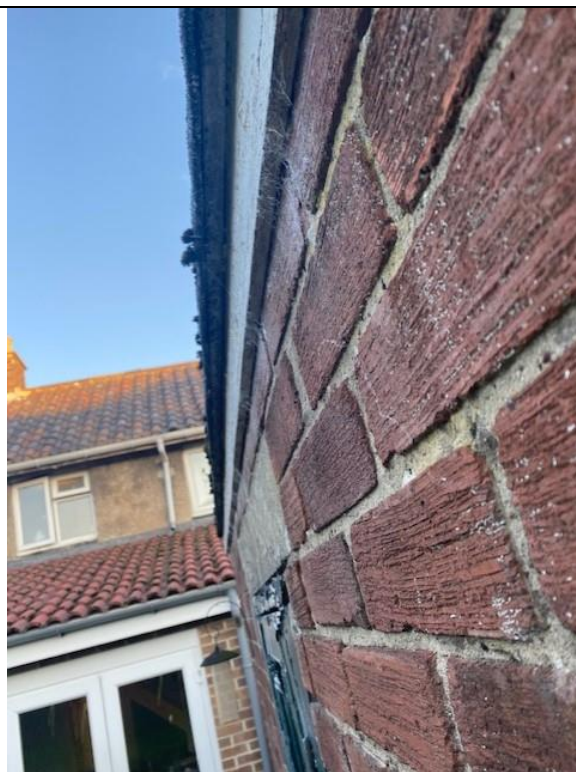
Showing the rear/ north western elevation with the existing single storey extension.
